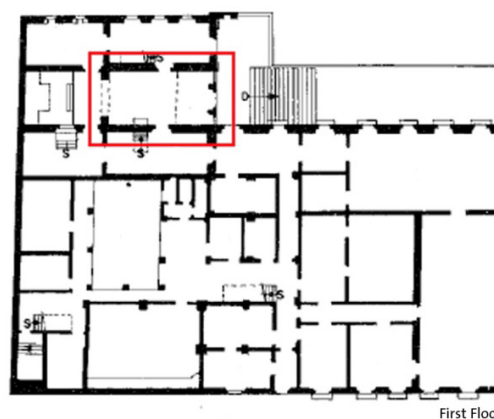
The Chapel annexed to the building, first floor plan [6]
